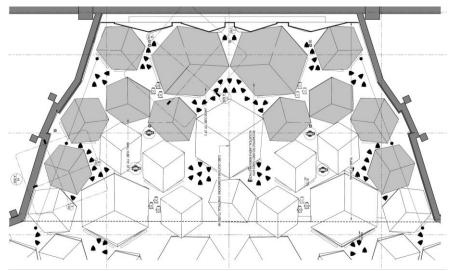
Reflected ceiling plan of stage. Shaded ceiling cubes were changed from plaster to broadband sound absorbers in the alteration works. (courtesy of KPMB architects).
